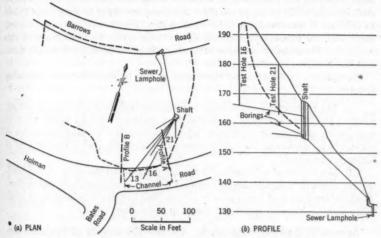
Plan and Profile, Barrows-Holman Slide, Oakland, Calif.
